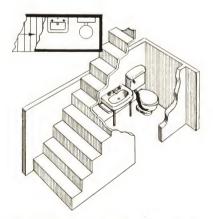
How Space Under Stairs Can Be Used for a Half Bathroom
